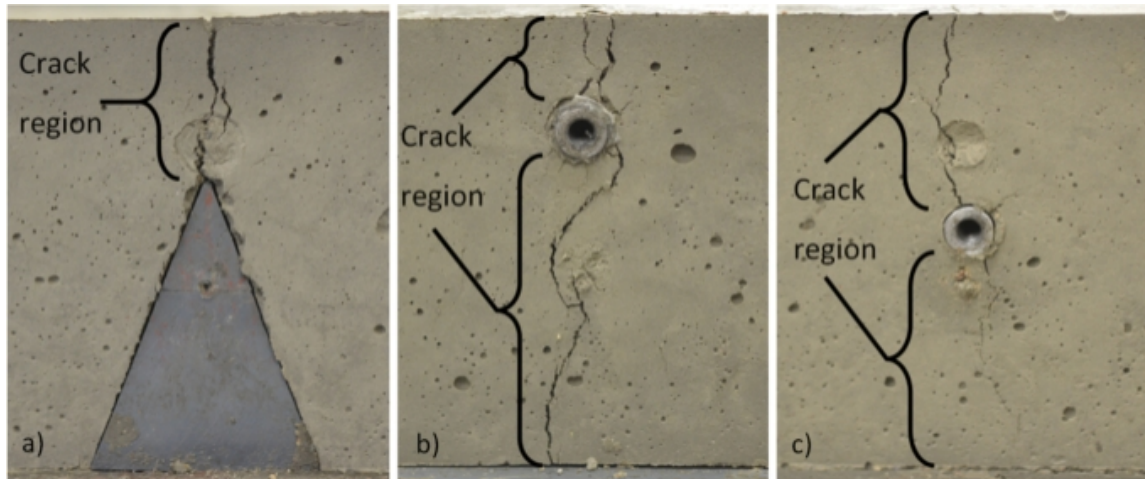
Images showing the centre cracks captured with the Perspex side panels removed at 5 hours after casting for Mix C1 at Climate E1 for: a) Shrinkage cracking mould with 64 mm bottom triangular insert at centre. b) Shrinkage cracking mould with 10 mm steel bar restraint at centre with 20 mm concrete cover. c) Shrinkage cracking mould with 10 mm steel bar restraint at centre with 40 mm concrete cover.
